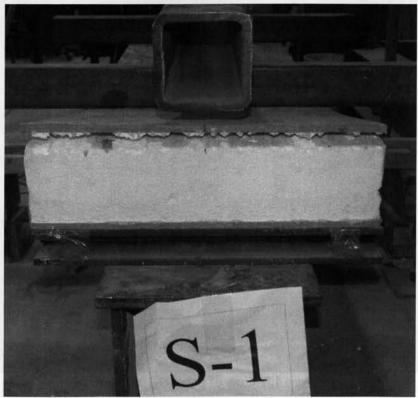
Close-up view of foam-OSB splitting over the support of specimen S-1 at failure
